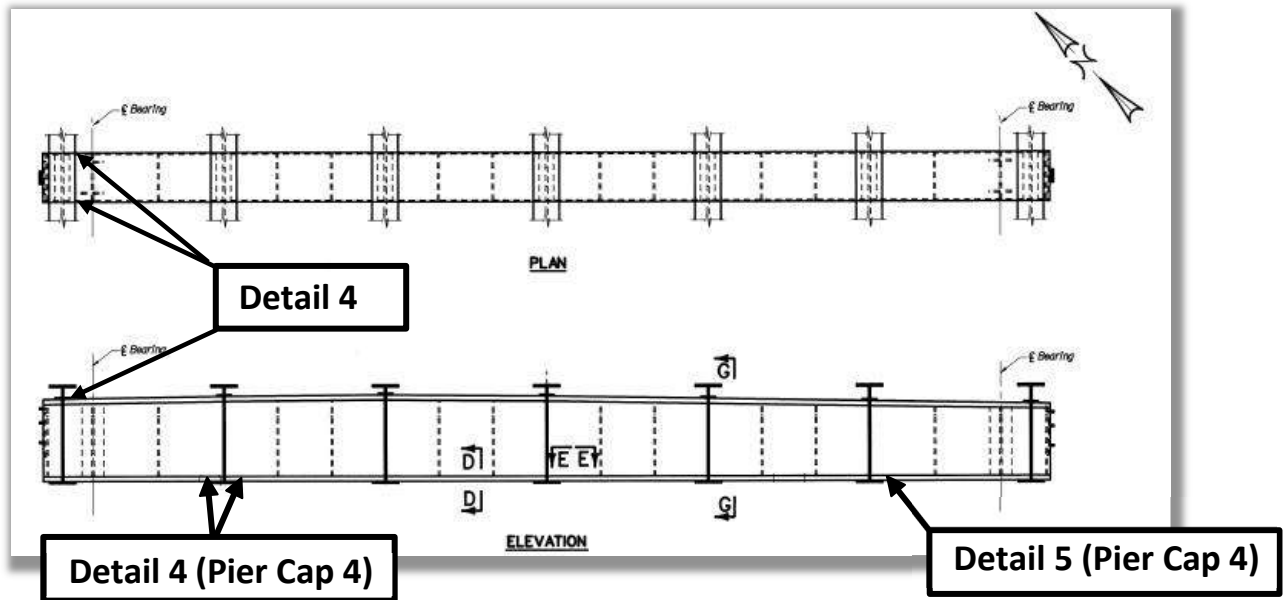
Plan and elevation of Pier Caps 3 & 4 with Fatigue Prone Details
